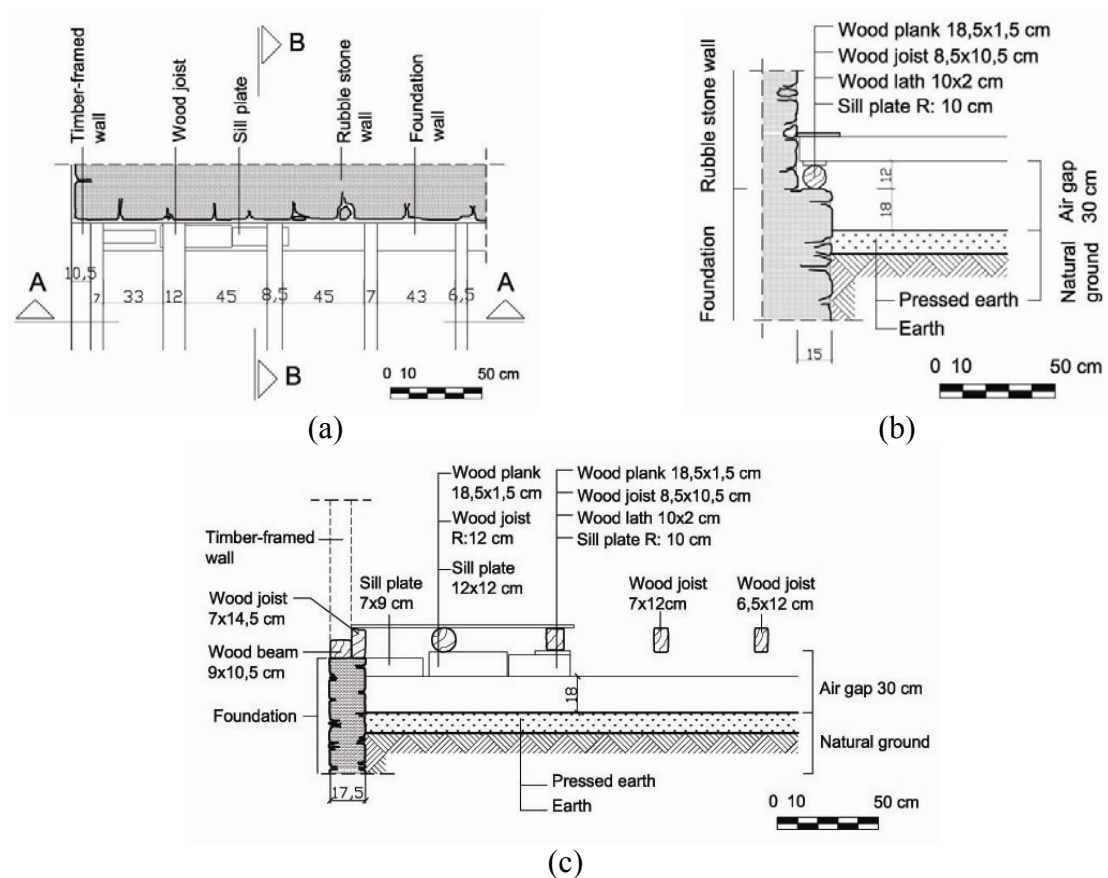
Details of a ground floor covering the basement. a. Plan, b. Section B-B, c. Section A-A (Recai Güreli St. No: 12)
